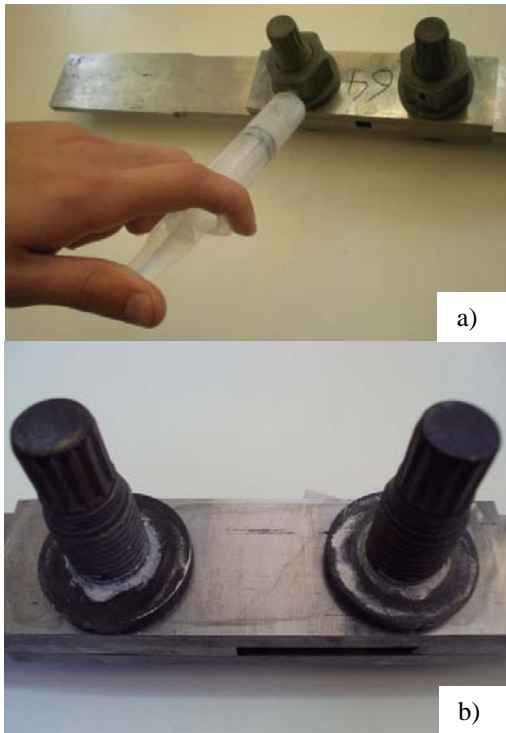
Resin-injection bolts: a) injection of resin; b) injection bolts with nuts removed, showing the filled clearance.
